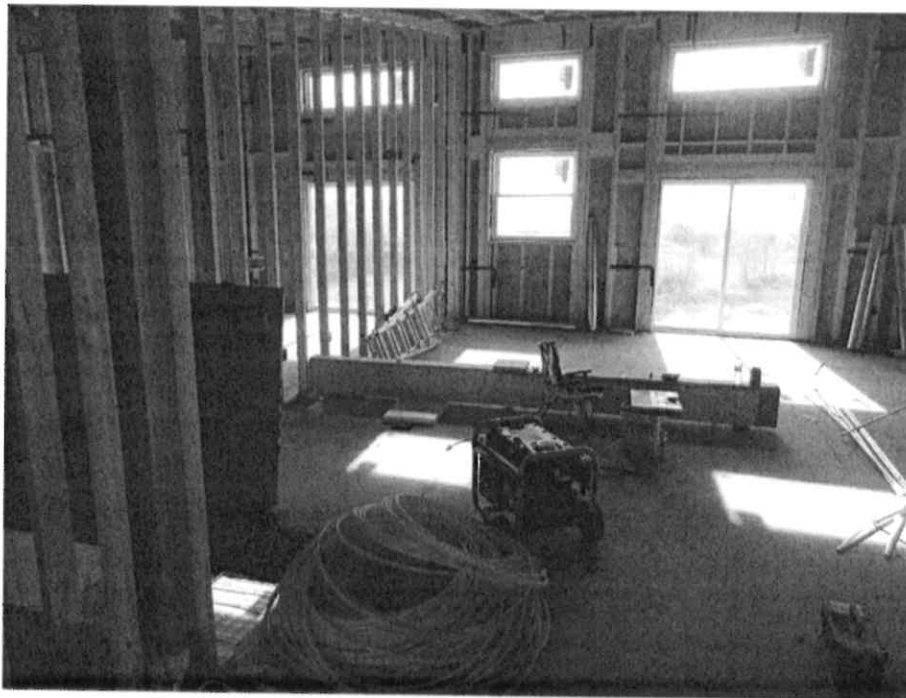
View of the main level, interior floor space looking south into the Living Room area.
